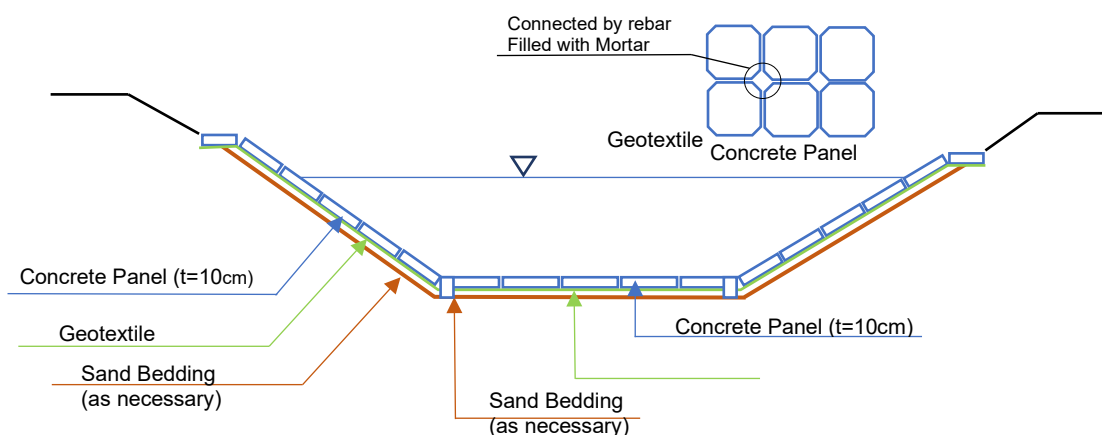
Standard Cross Section and Precast Concrete Panel Lining
